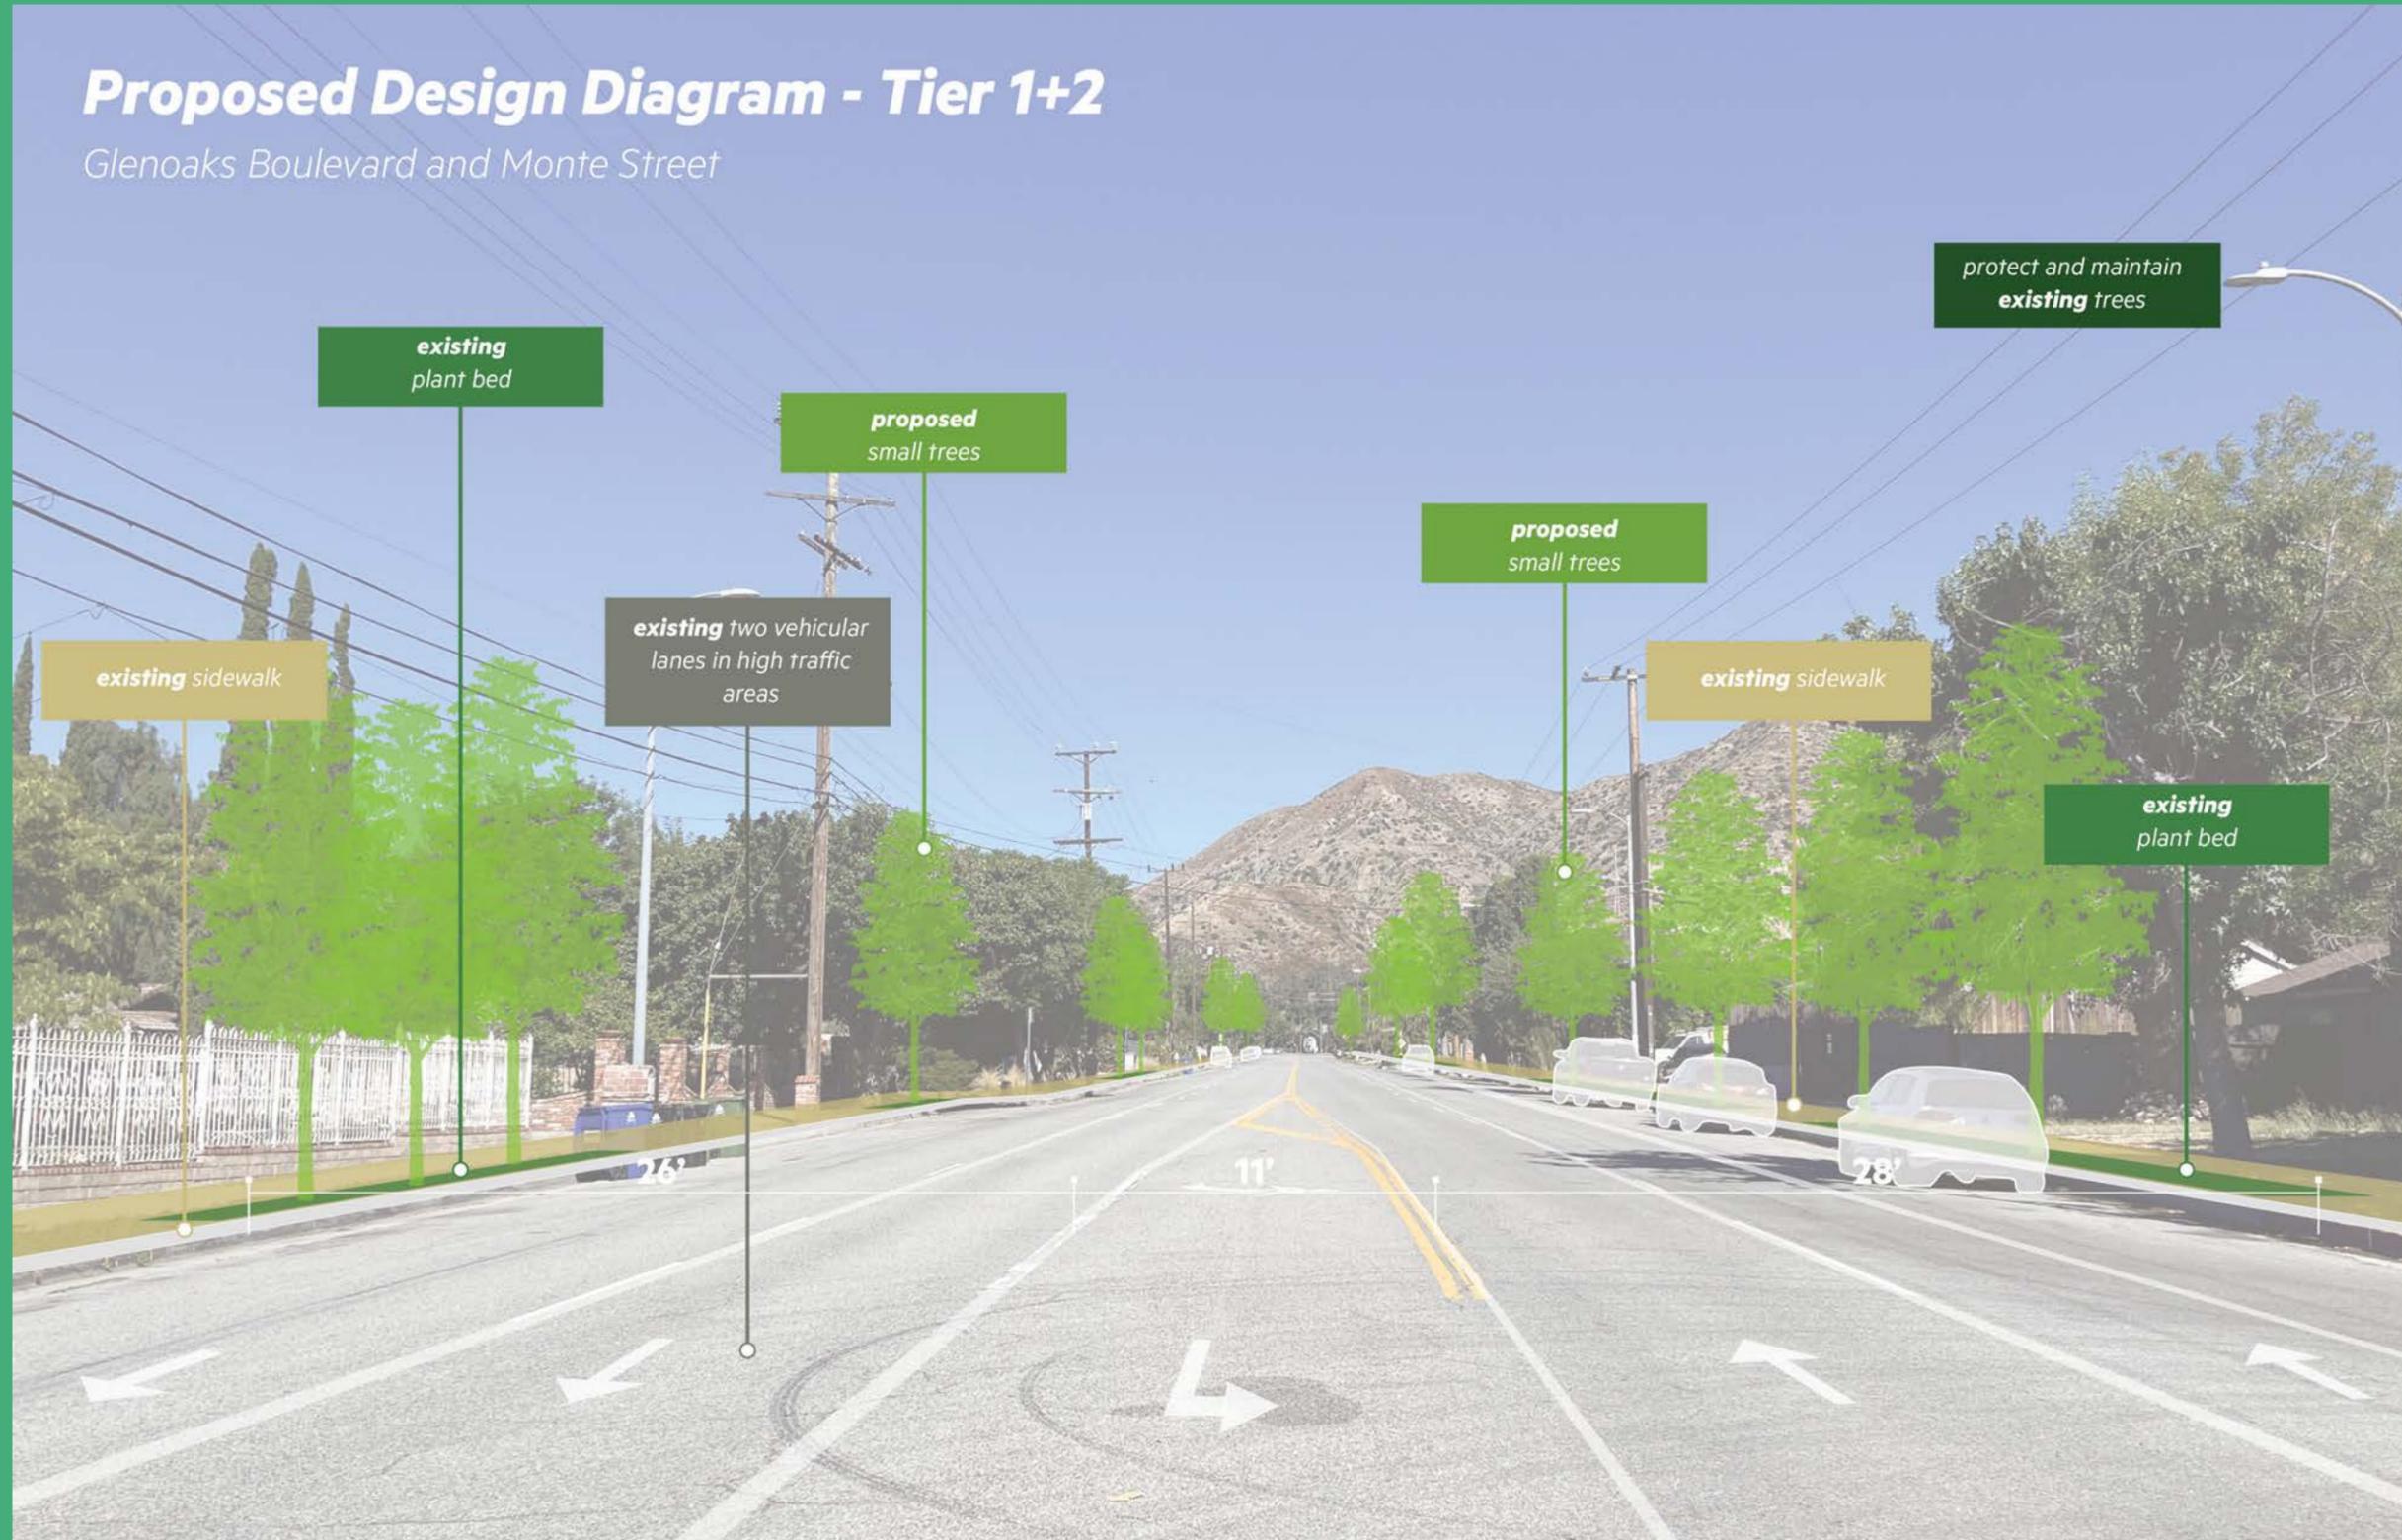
Glenoaks Boulevard and Monte Street, proposed design diagram, Tier 1 and Tier 2
